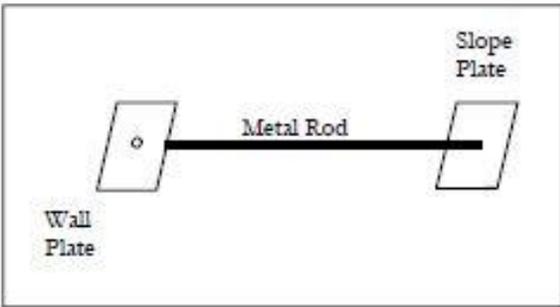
A. Cross Plate Anchor. A double plate anchoring system connected by a metal rod. Rod is driven through undisturbed soils to connect plates.
